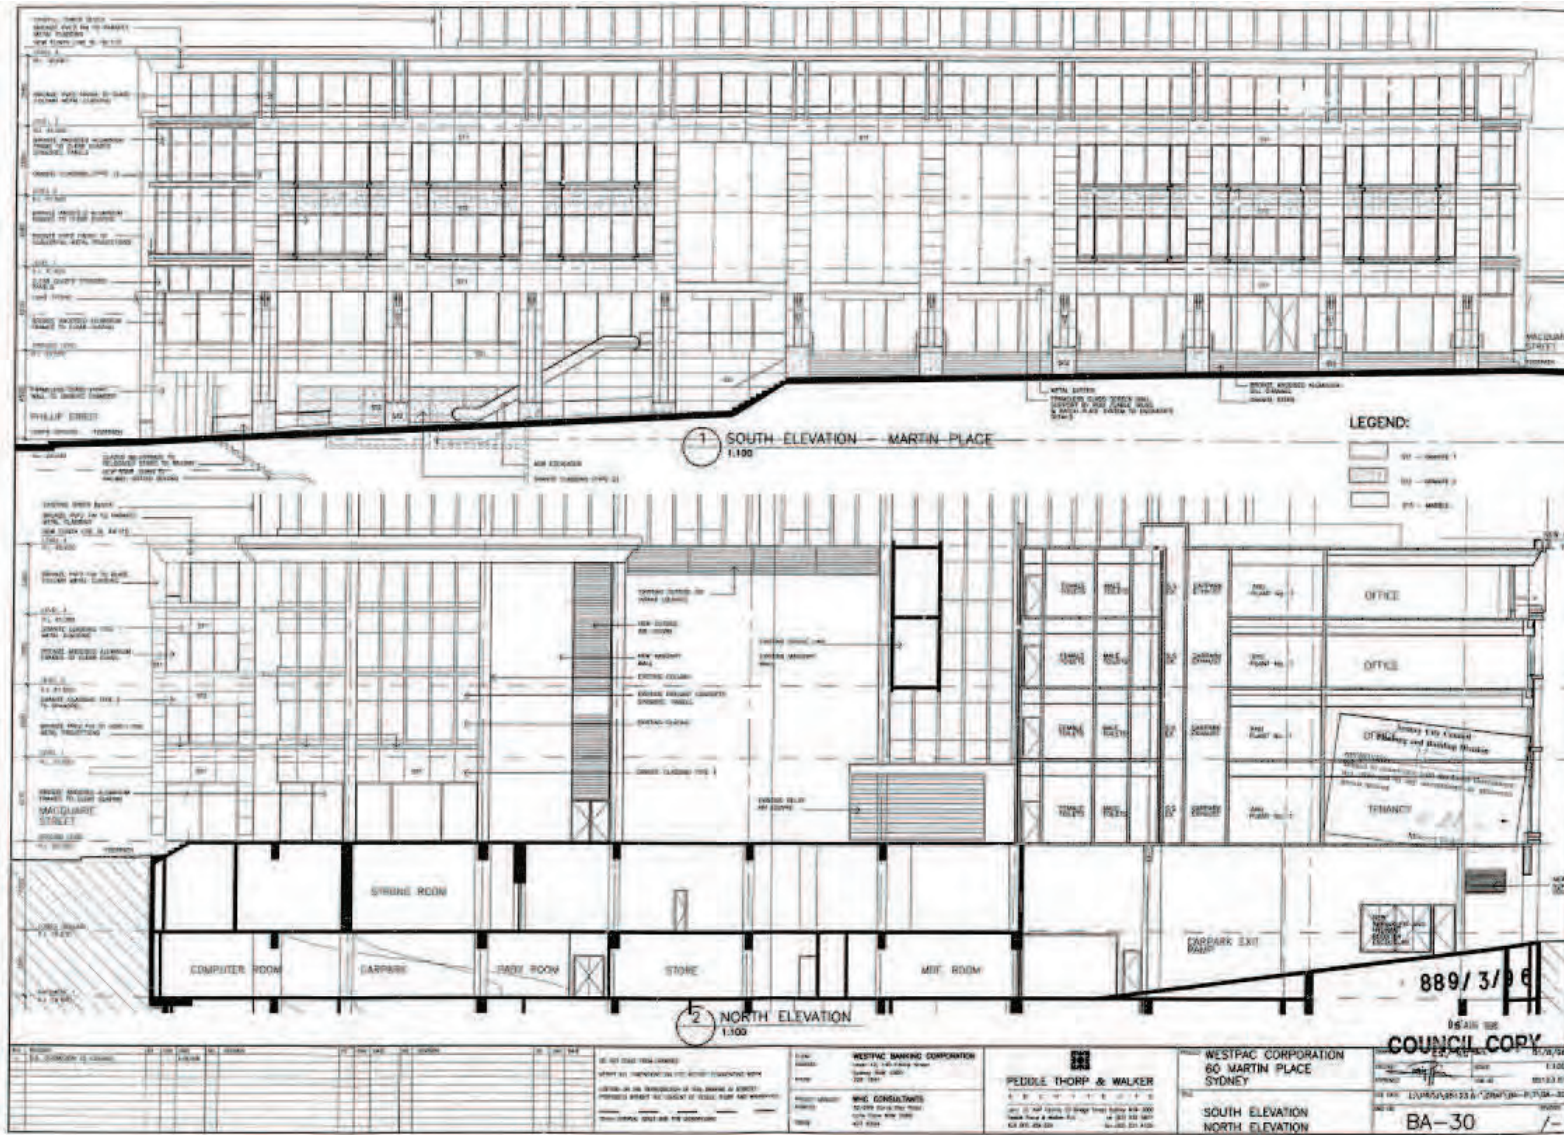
Detailed north and south elevations of the podium additions at 60 Martin Place, Sydney.
